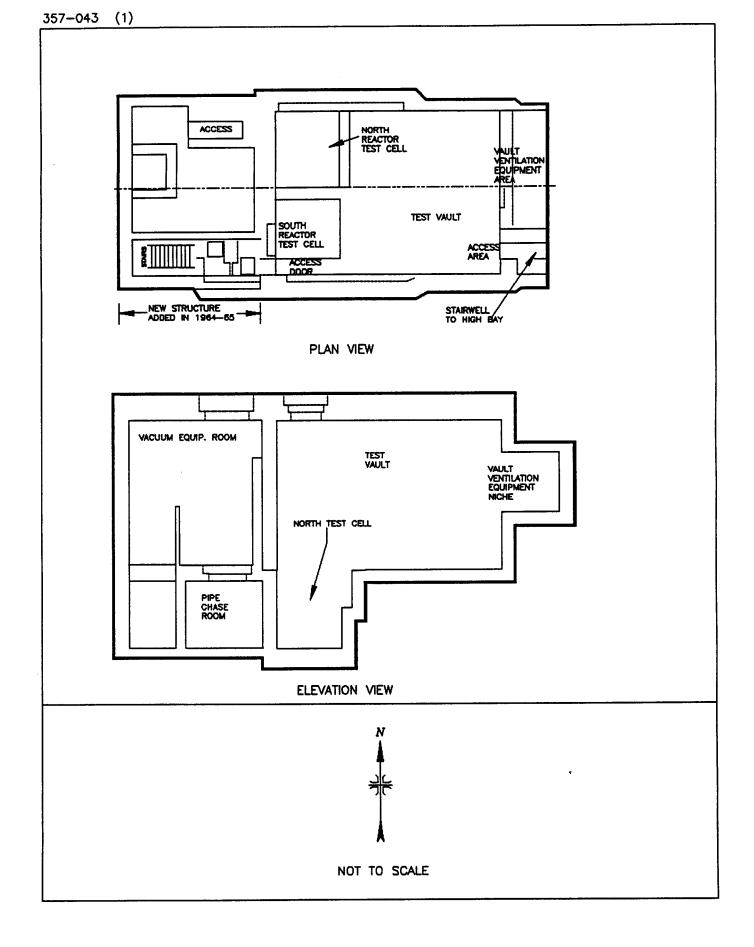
Building 059 - Location of North Test Cell and Pipe Chase Room
